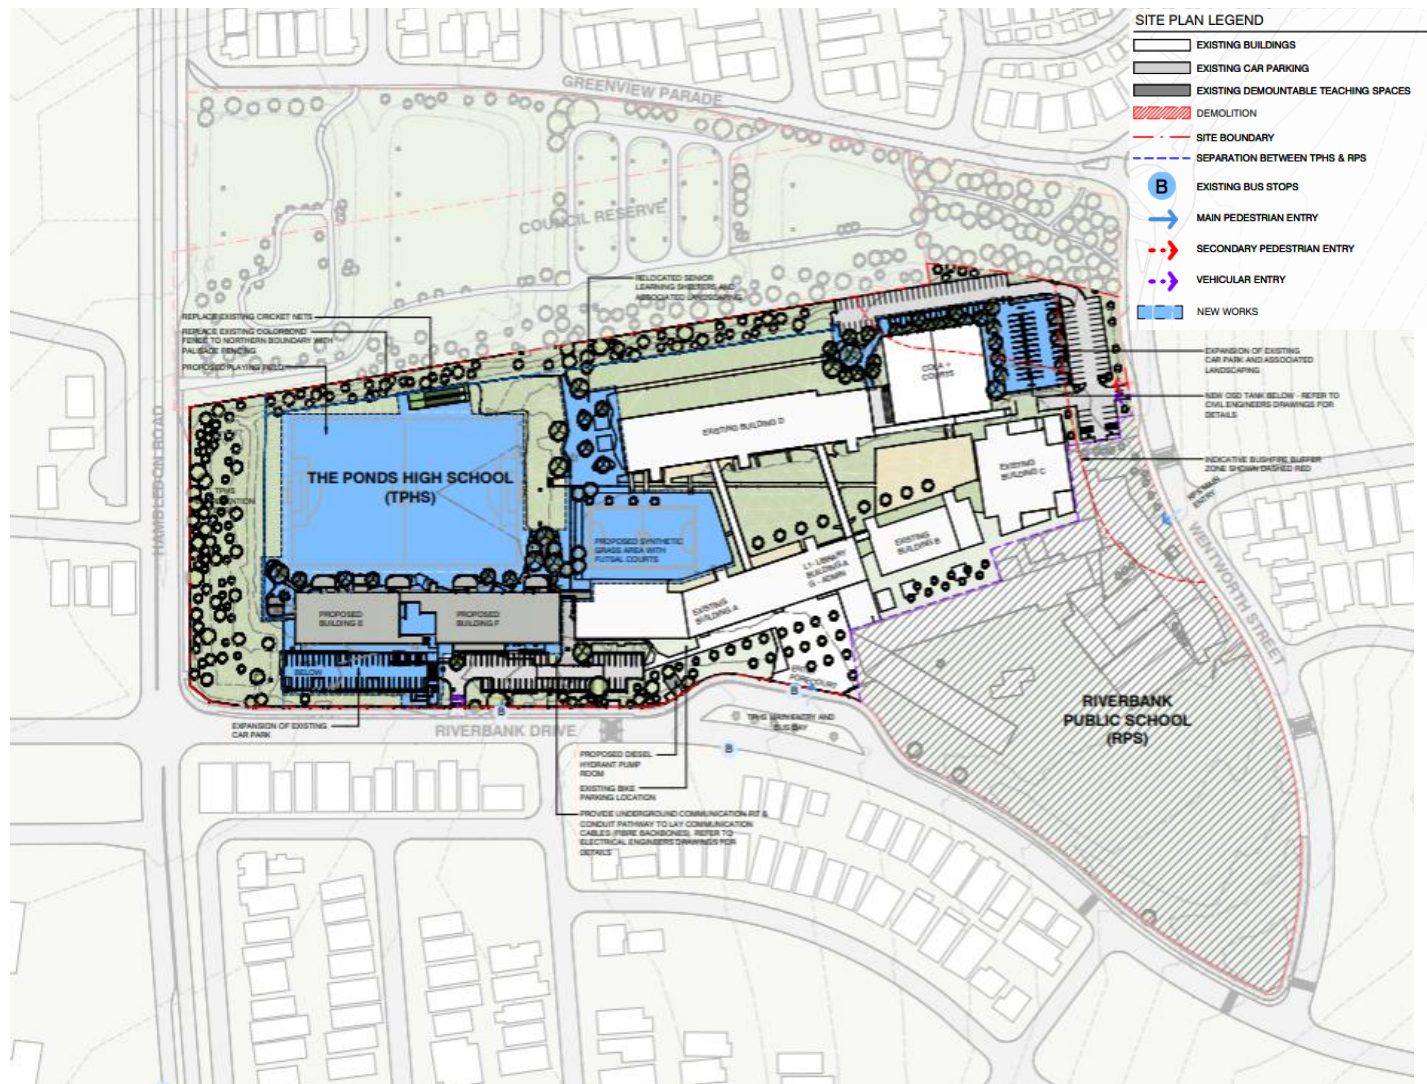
Campus Site Plan - Indicative (Source: DJRD Architects)
